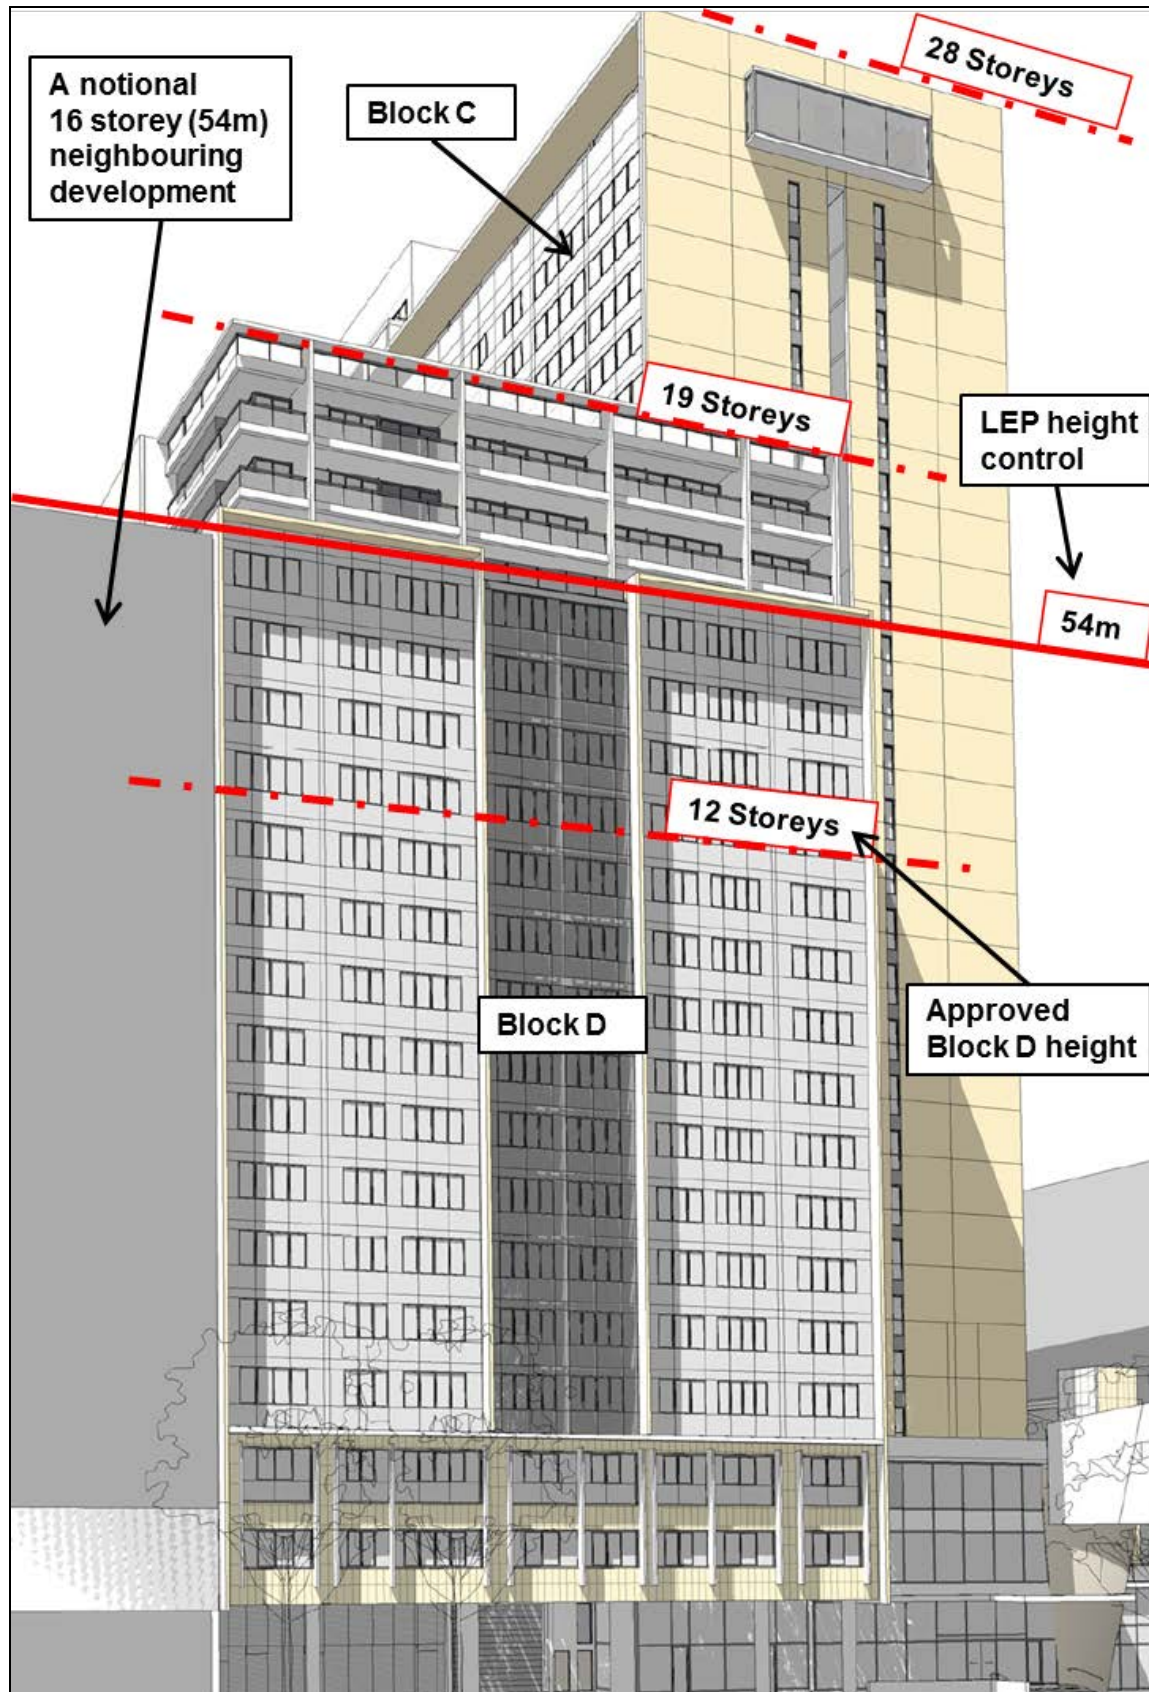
Proposed Hunter Street elevation of Block D (Base source: proponent's RtS)
